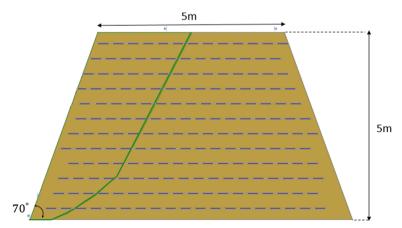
Potential failure plane of the Han Great Wall, the reinforcements are discontinuous, and the apparent cohesion is not taken into account (FS = 1.48)
